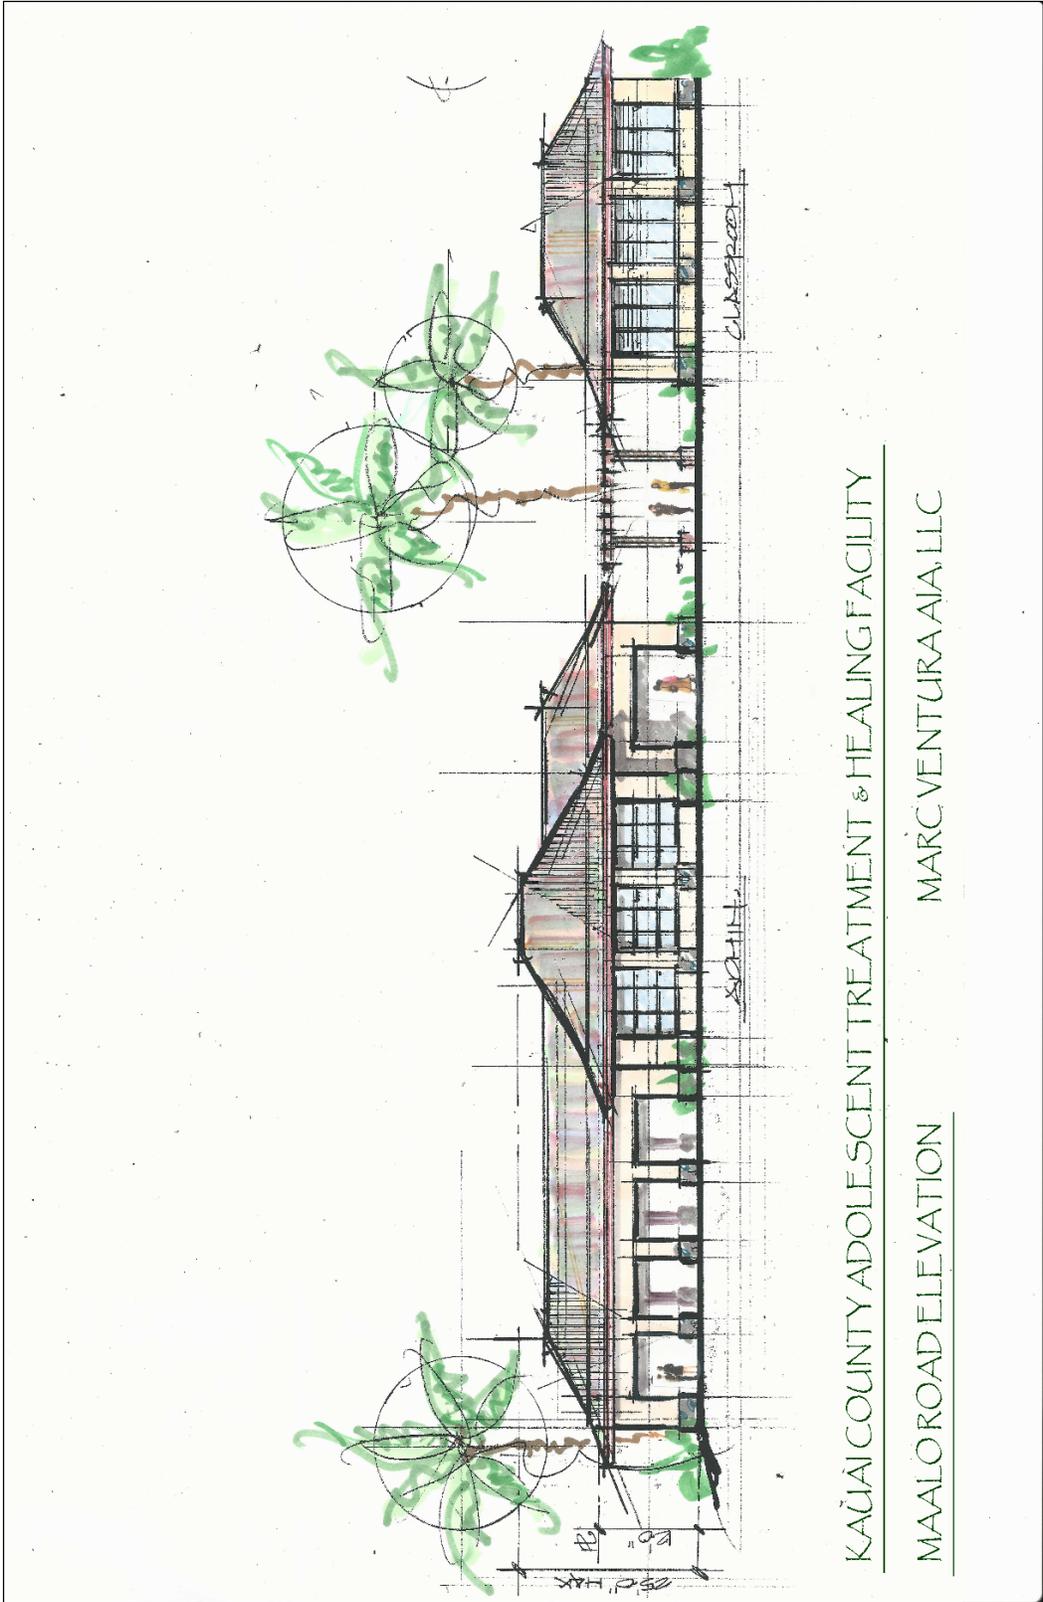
Proposed Facility, Viewed from Mā'alo Road
